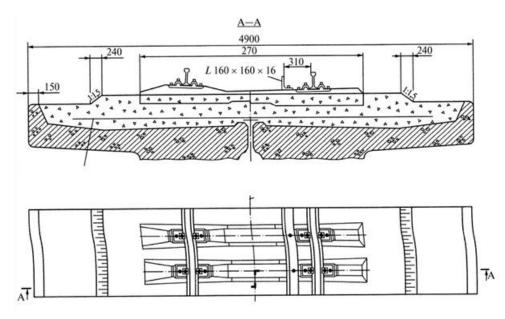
Bridge deck with driving on crushed stone ballast and reinforced concrete sleepers with ballast trench providing for passing of crushed stone cleaning machines: left - without guards; right - with guards.
